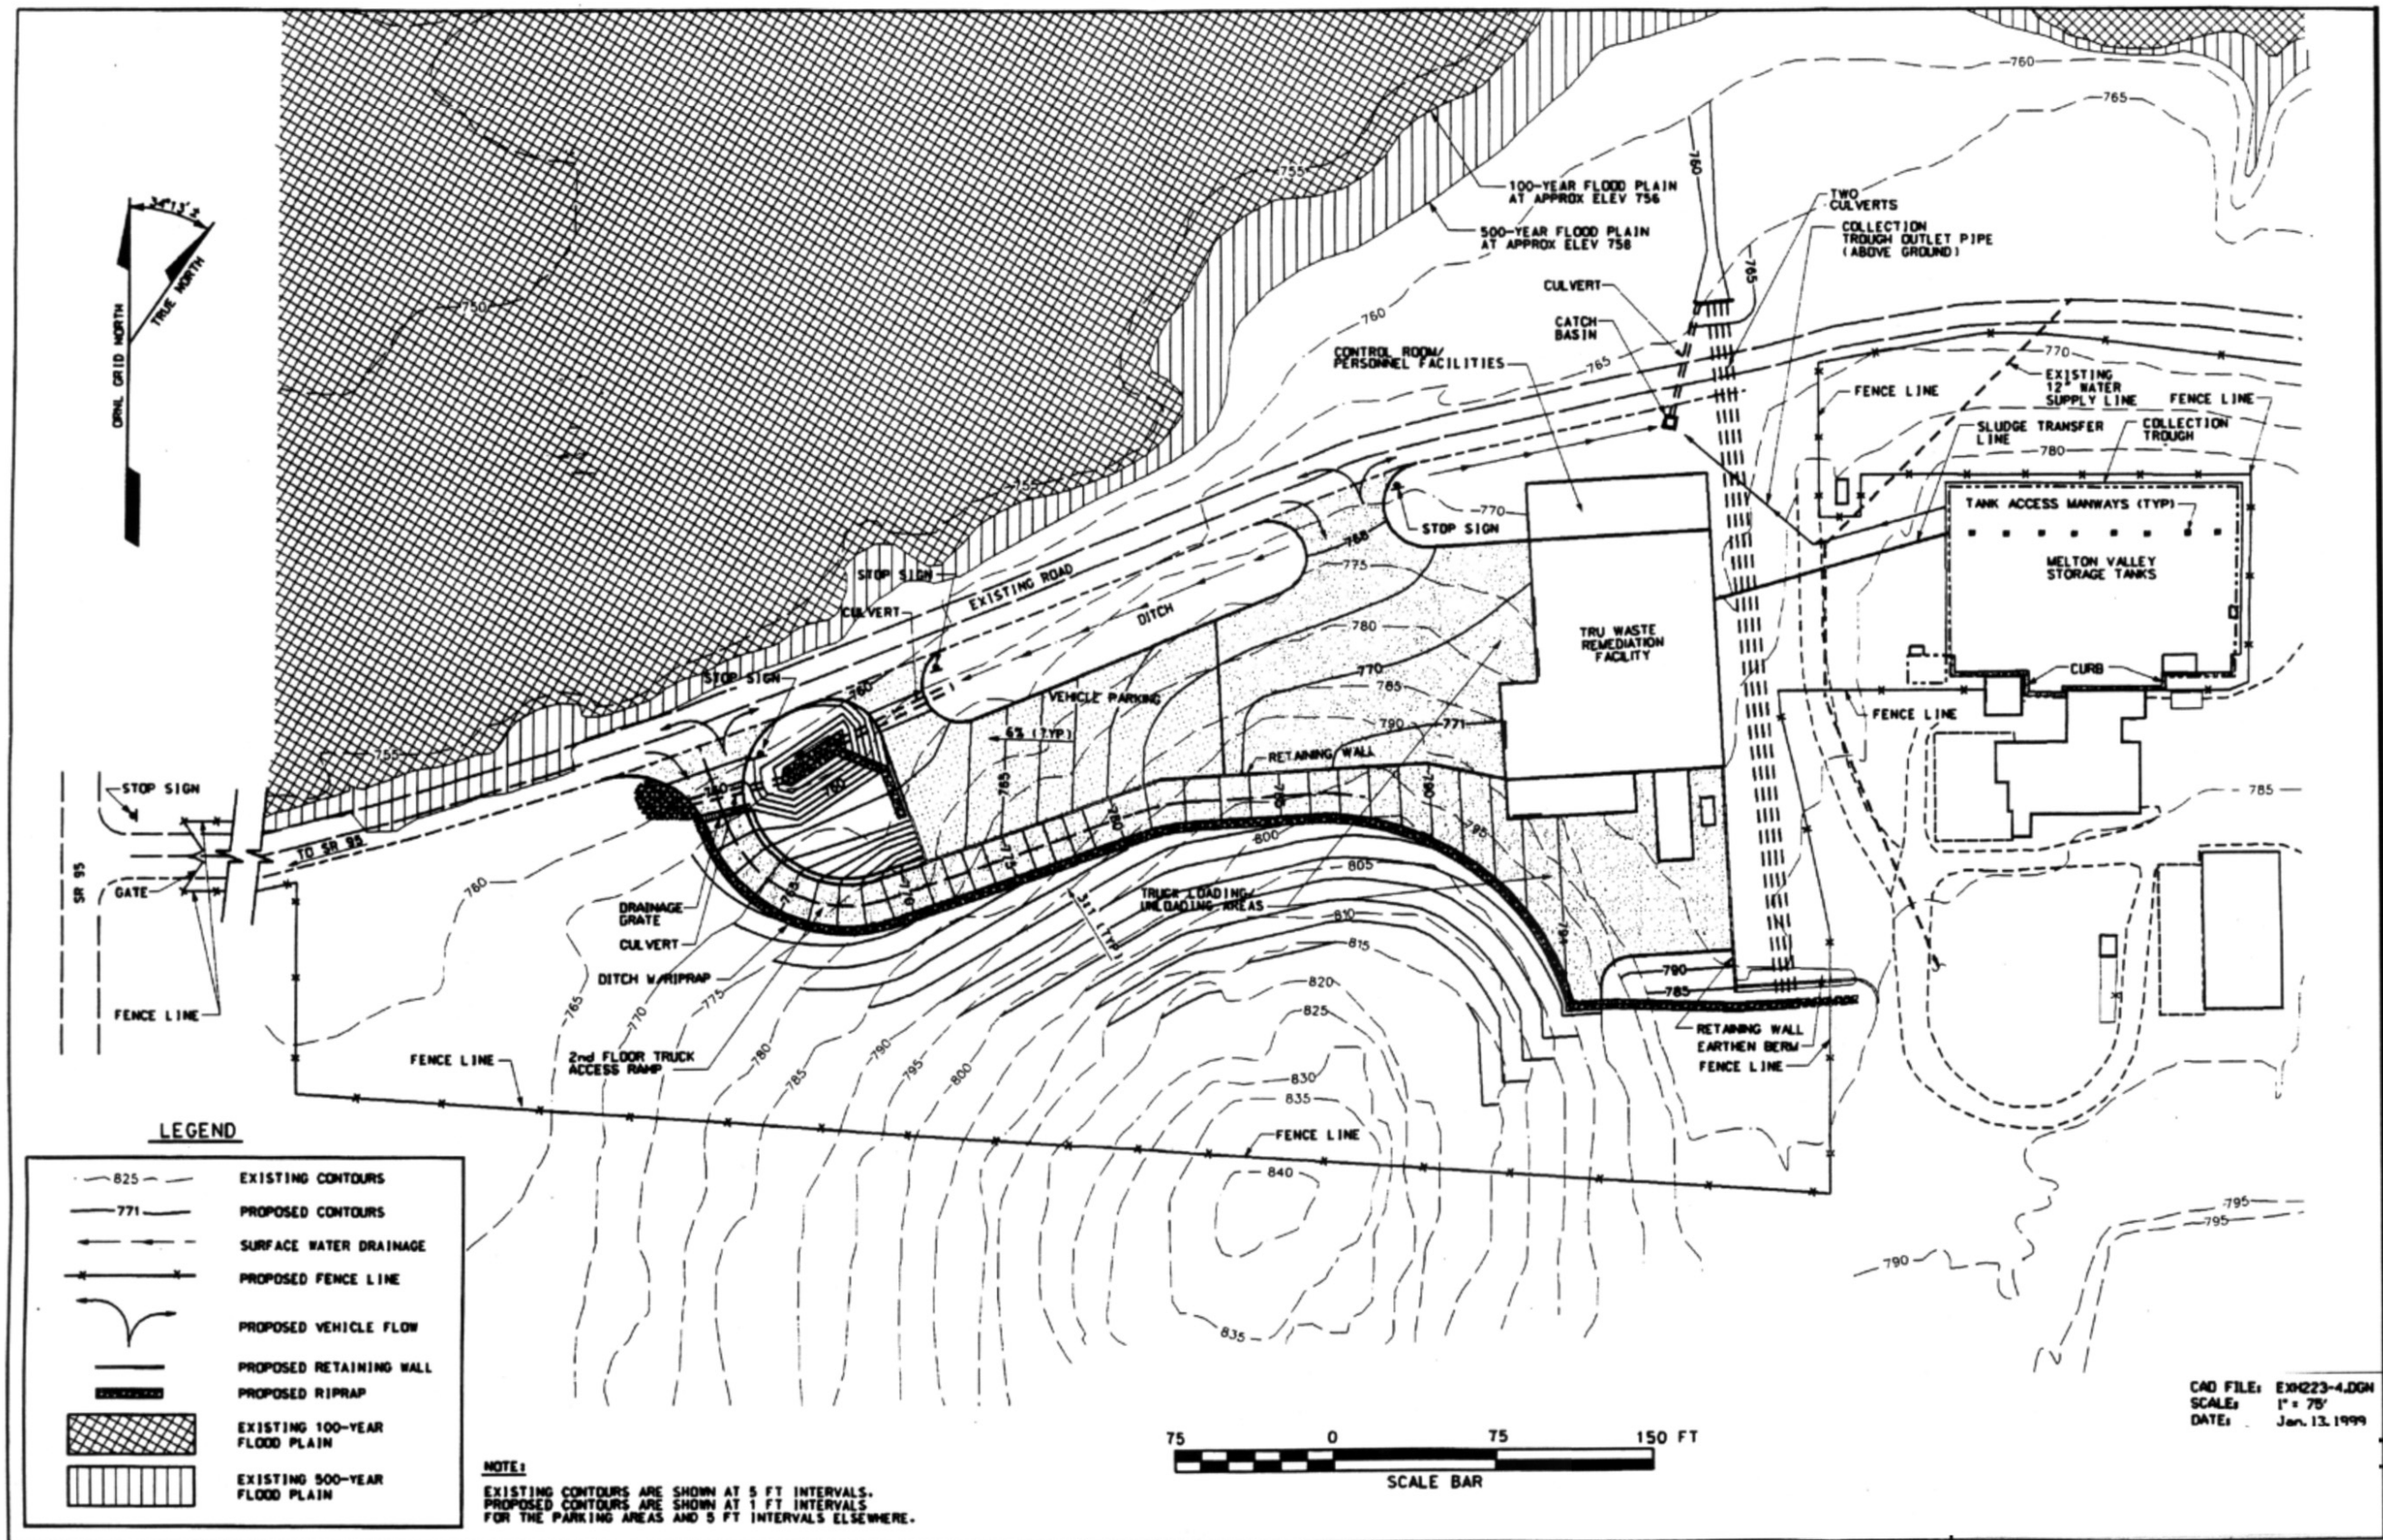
Proposed site layout for the Low-Temperature Drying Alternative facility, including the locations of the existing Melton Valley Storage Tanks, the process building with truck access and turnaround areas to the first and third floors, and storm water drainage modifications. Site excavation would be minimized by optimizing the topography of the site with the layout of the Low-Temperature Drying Alternative
